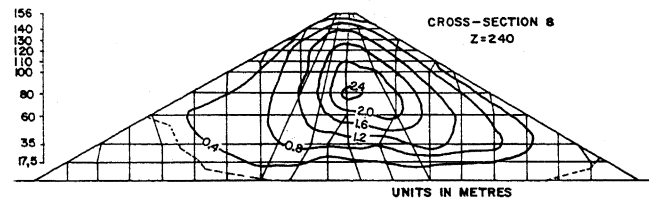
DEFORMED TYPE TRANSVERSAL CROSS-SECTION
